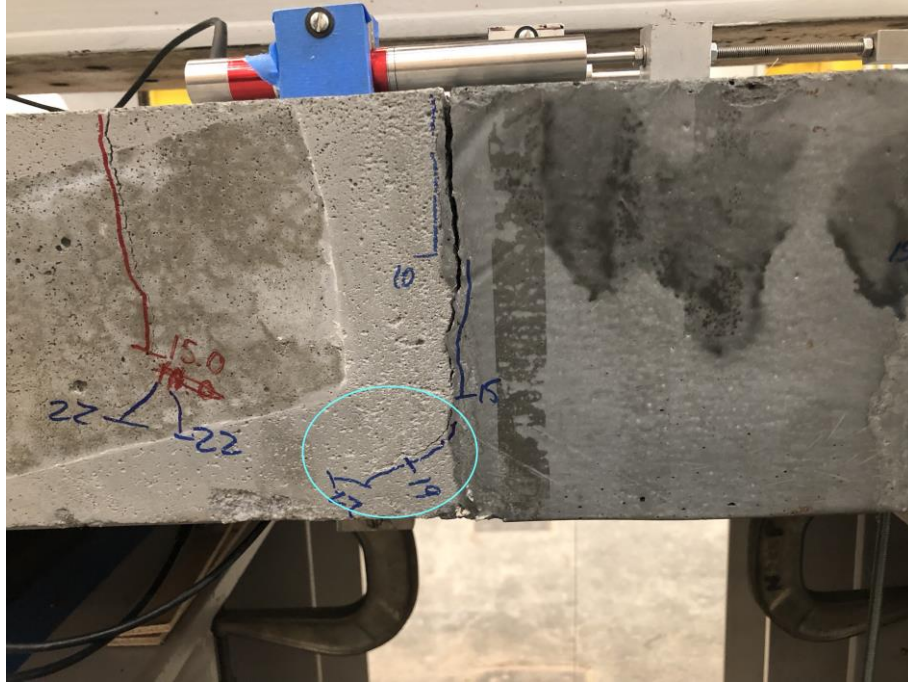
Schematic. Crack widths surrounding UHPC joint on south face of specimen at nominal capacity.
